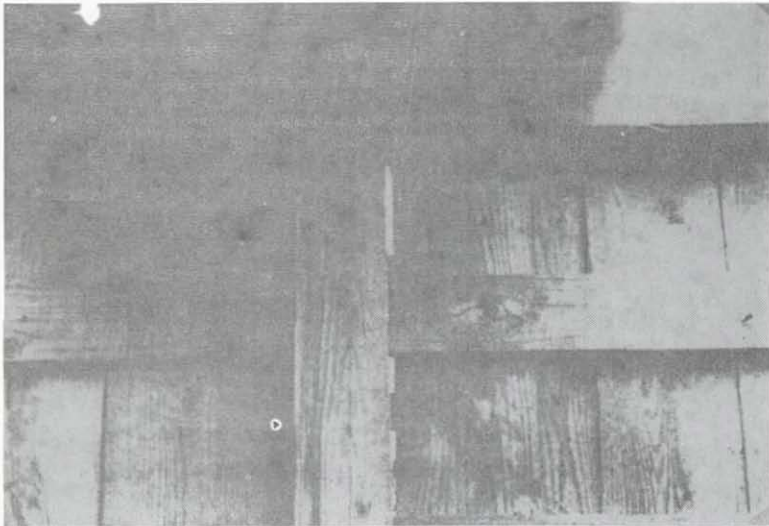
WEDGE AT COLUMN-RAIL CONNECTION
